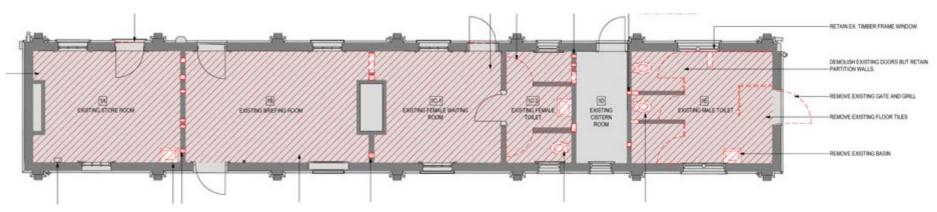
Platform Building 1: Proposed building reconfiguration
